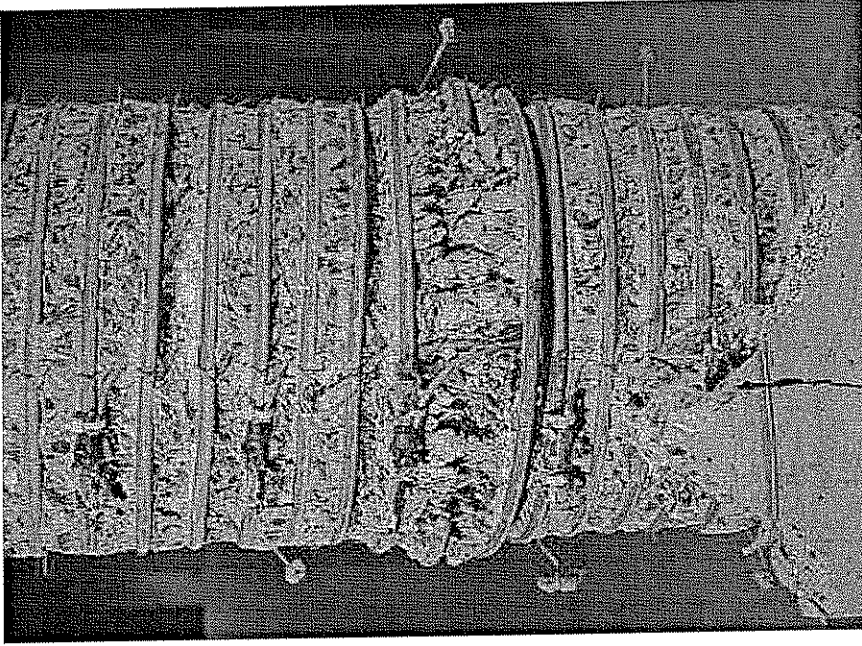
Schematic drawing of post-test appearance of Specimen 14-D'.
